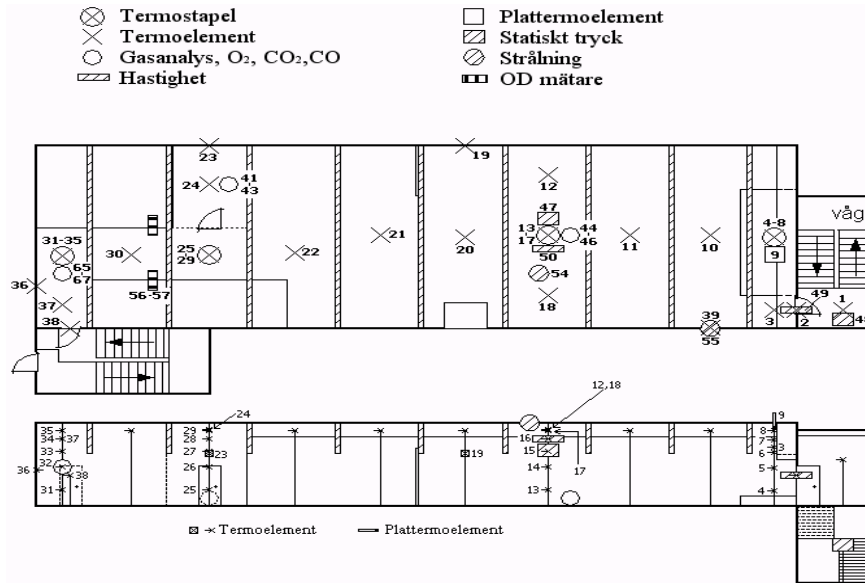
1/4 scale floor plan of Gothenburg Disco building. Redrawn from [1].
